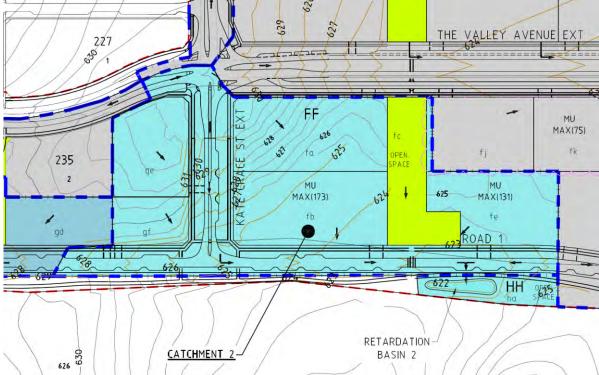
Hydrology EDP Plan (Indesco, 2016)
